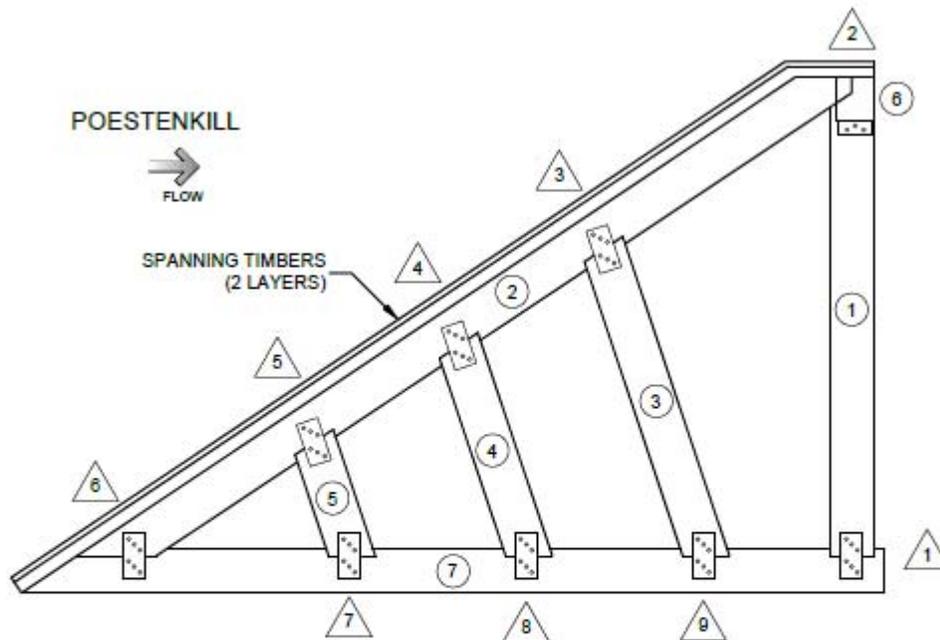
TYPICAL CROSSWISE SUPPORTING STRUCTURE (BENT)
